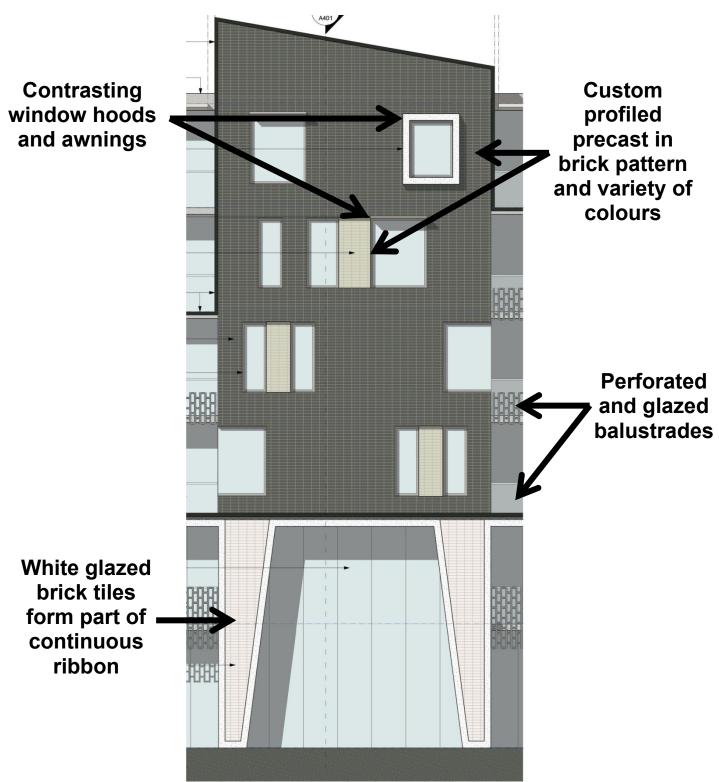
Detailed elevation showing the proposed façade elements, materials and finishes.
